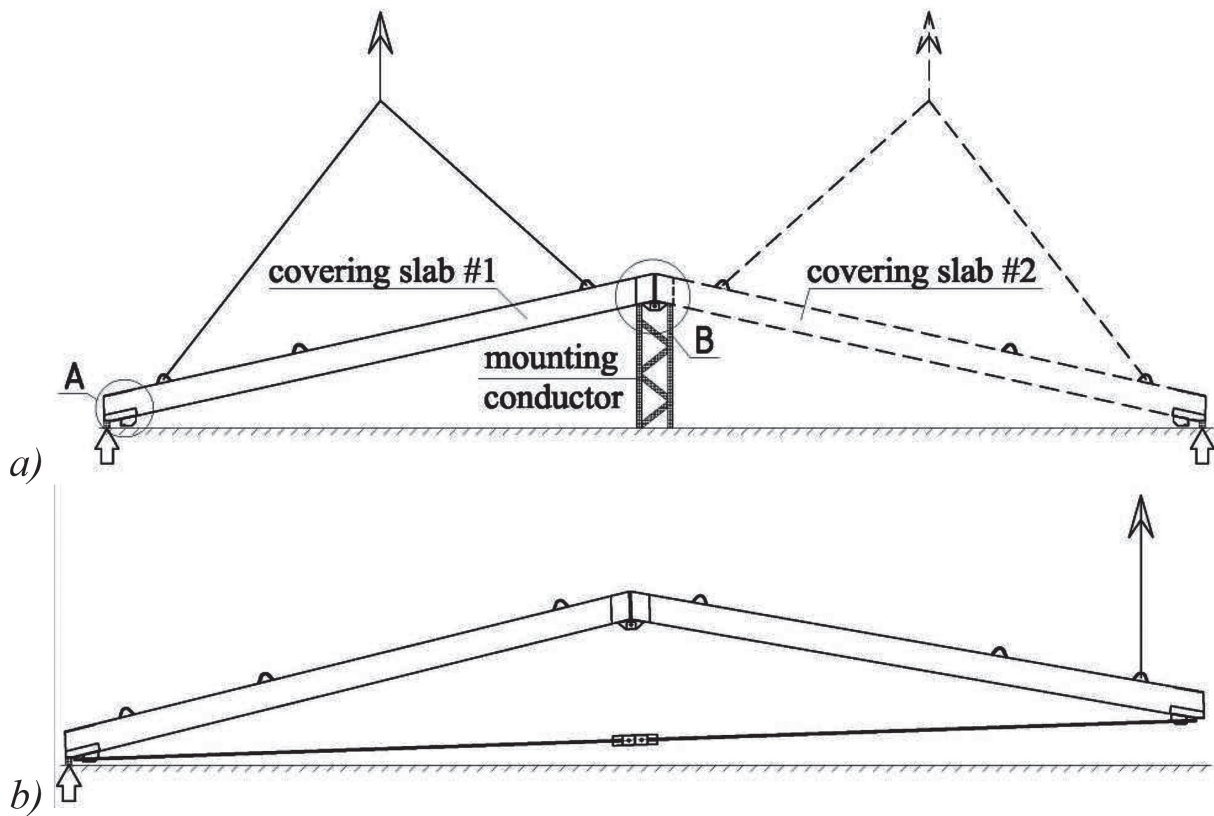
Scheme of the enlarging assembly of the covering panel: a) installation of two ribbed slabs on the conductor; b) tensioning of the steel brace
